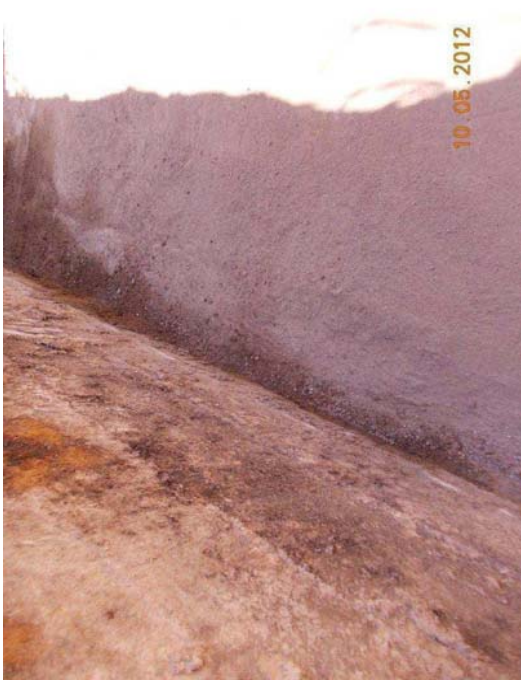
No stain or crack was identified on the walls or base of the concrete box containment.
